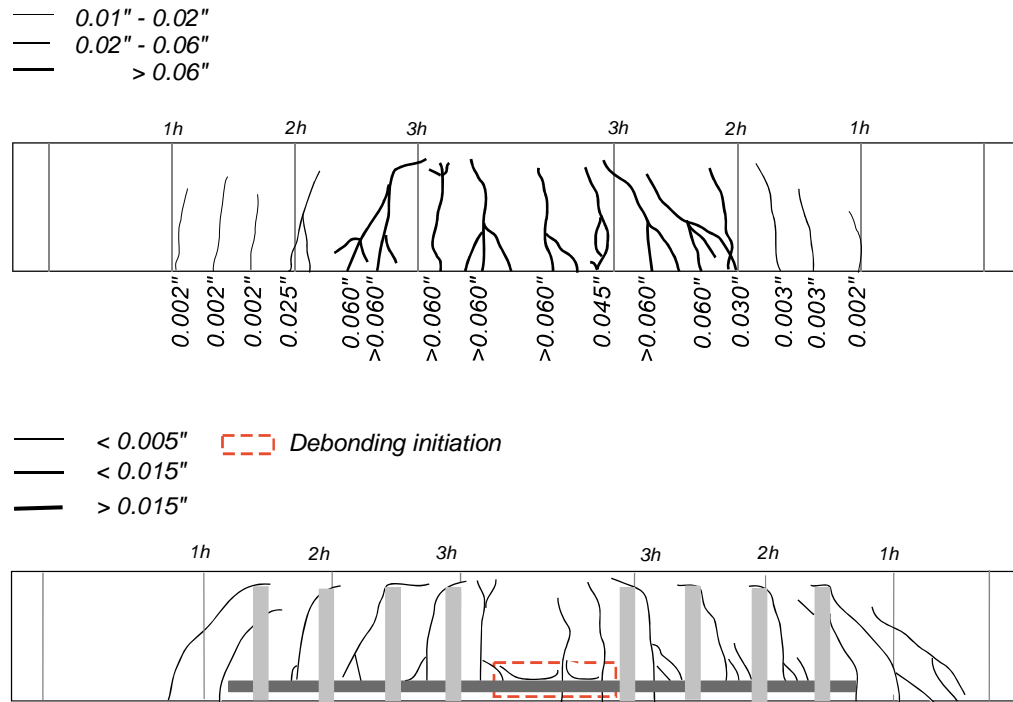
Crack pattern after failure of specimens from the SK series subjected to monotonic static loading (a) Unstrengthened, (b) Strengthened
